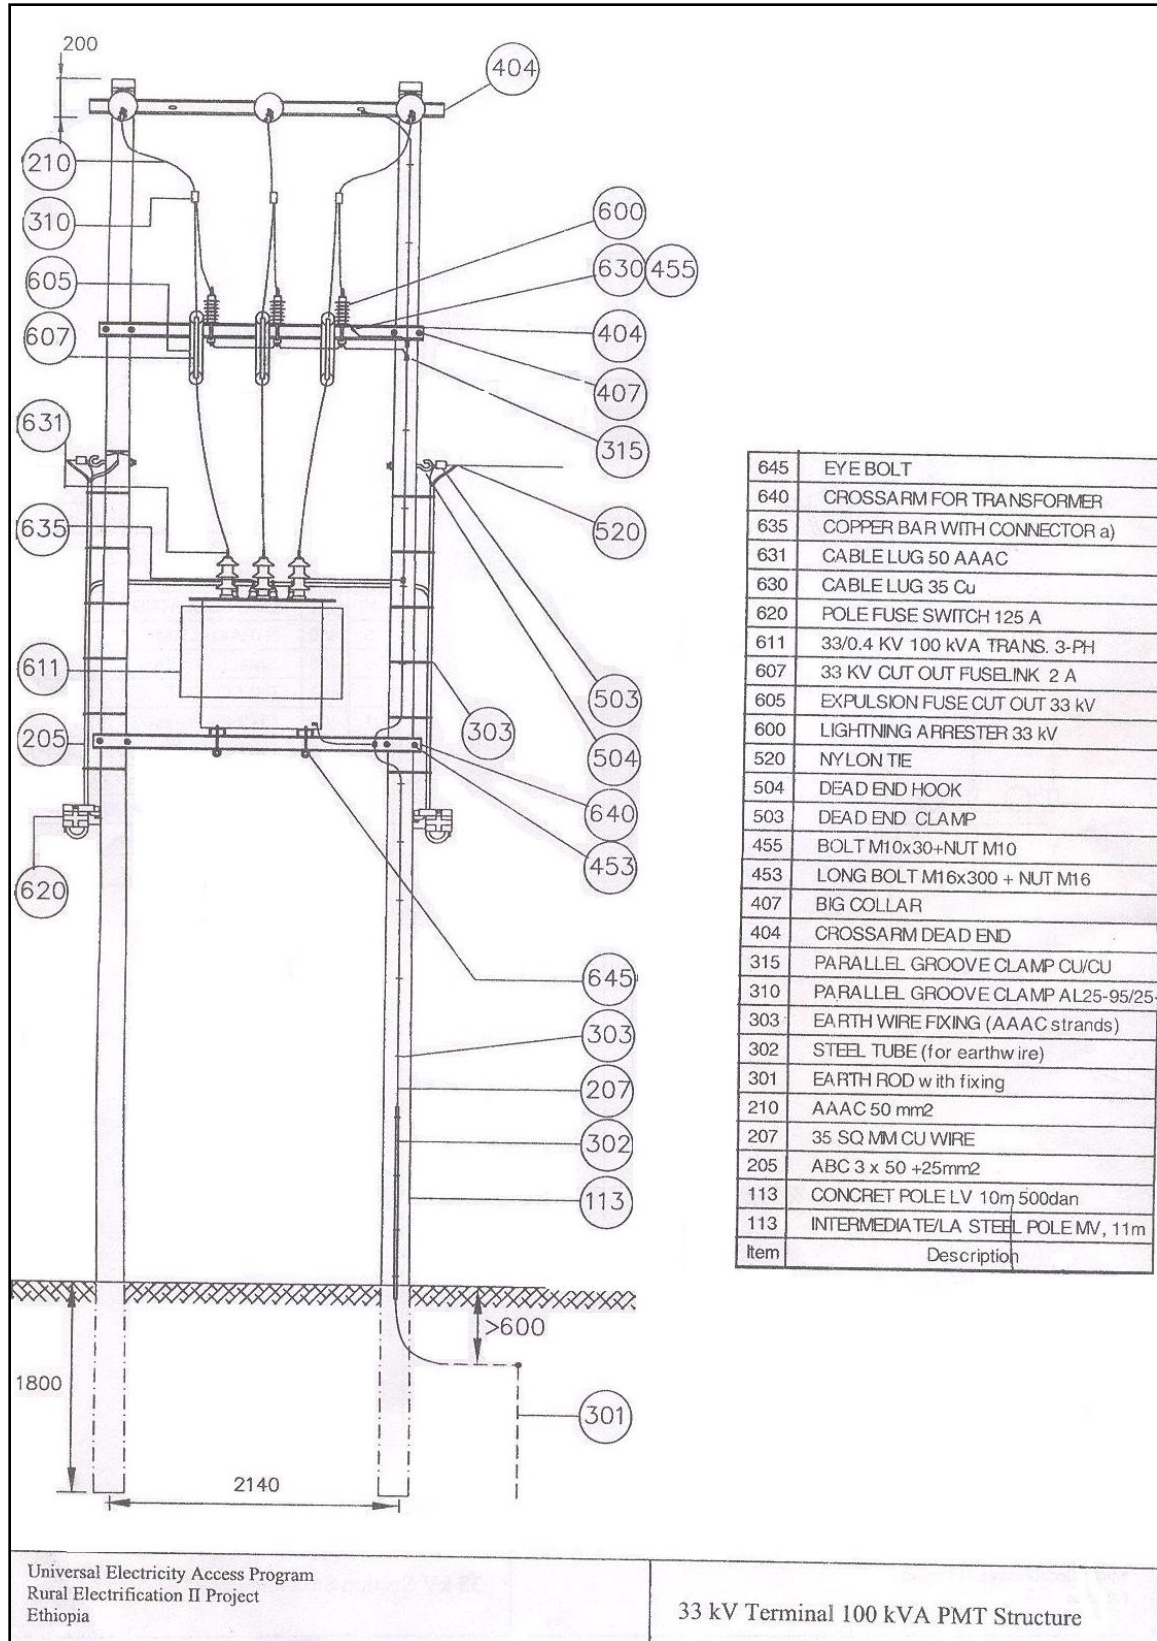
100kVA 3 phase transformer assembly with its accessories [15]
